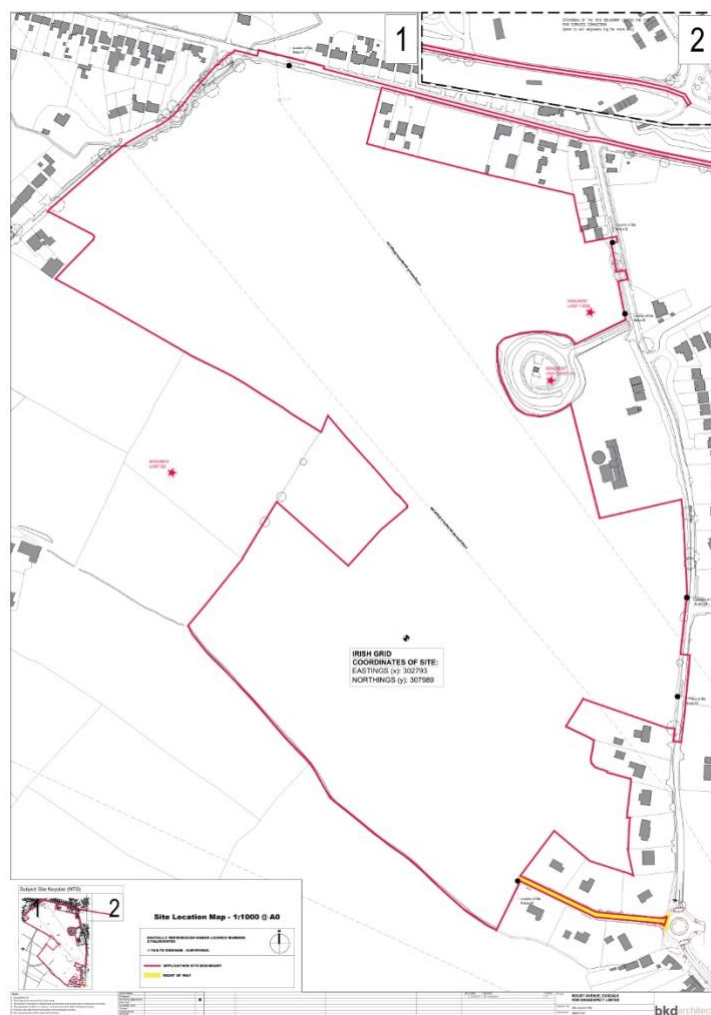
Proposed Site Red Line Boundary Mount Avenue, Dundalk (BKD Architects)
